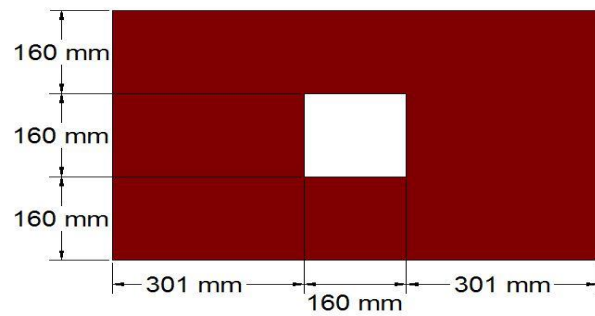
(b) Masonry wall with opening at the center of size 160×160
